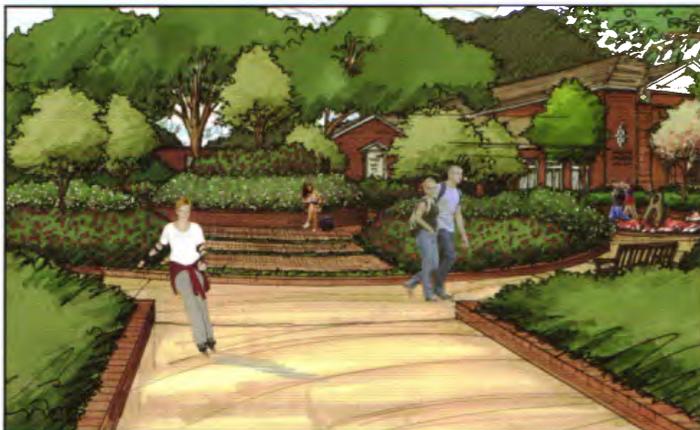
Brundrett Azalea Garden elevation drawing by Burnett and Partners, Inc.
